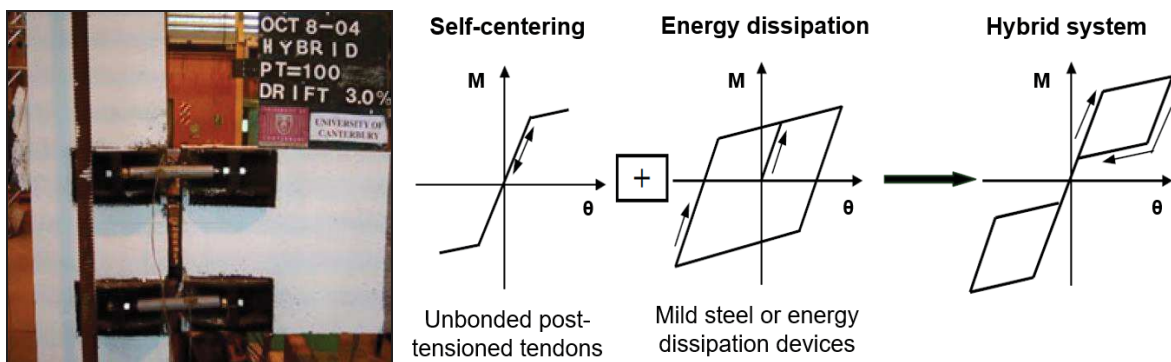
Left: Experimental tests on PRESSS concrete beam-column joints: configuration for Plug&Play dissipaters for beam-column joints (Marriott et al. 2008, 2009); Flag-shape hysteresis loop for a hybrid system (fib 2003).
